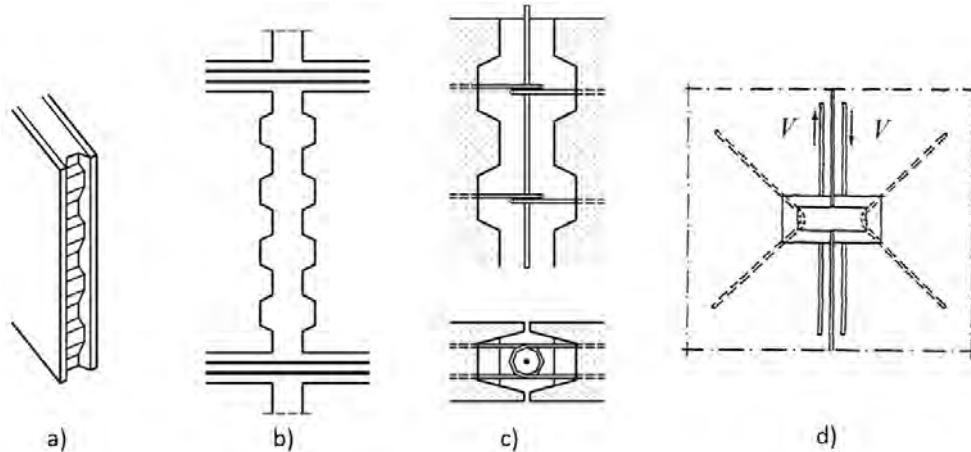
Typical vertical connection details: a) indented interface; b) concentrated reinforcement; c) overlapped U-bar reinforcement connection; d) welded steel plate [2]
